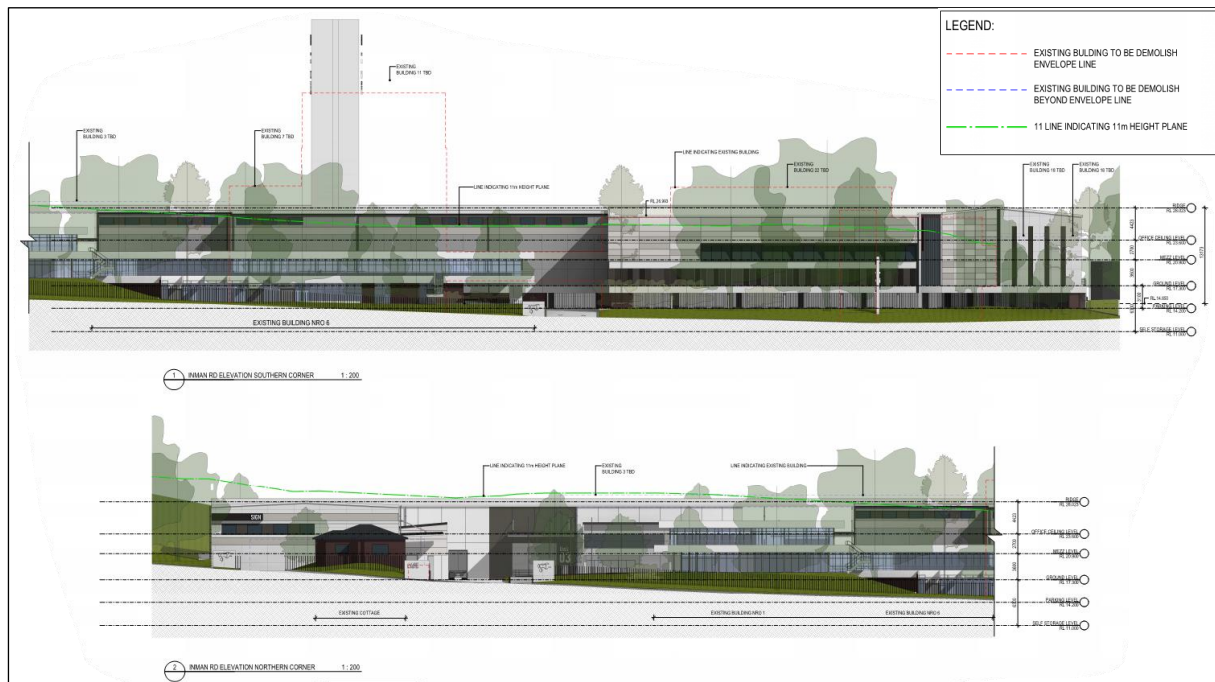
Inman Road Elevation (Source: SBA Architects, 2019)
